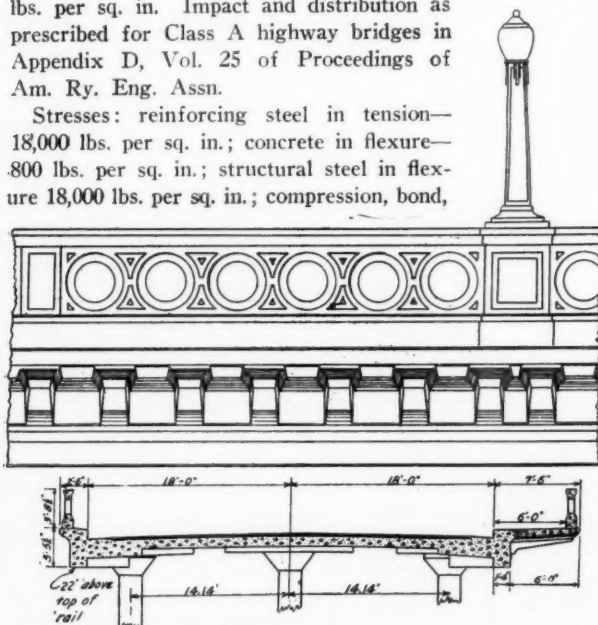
ABOVE—ELEVATION SHOWING ORNAMENTAL RAILING AND SIDEWALK BRACKETS. BELOW—CROSS-SECTION OF VIADUCT FLOOR.
